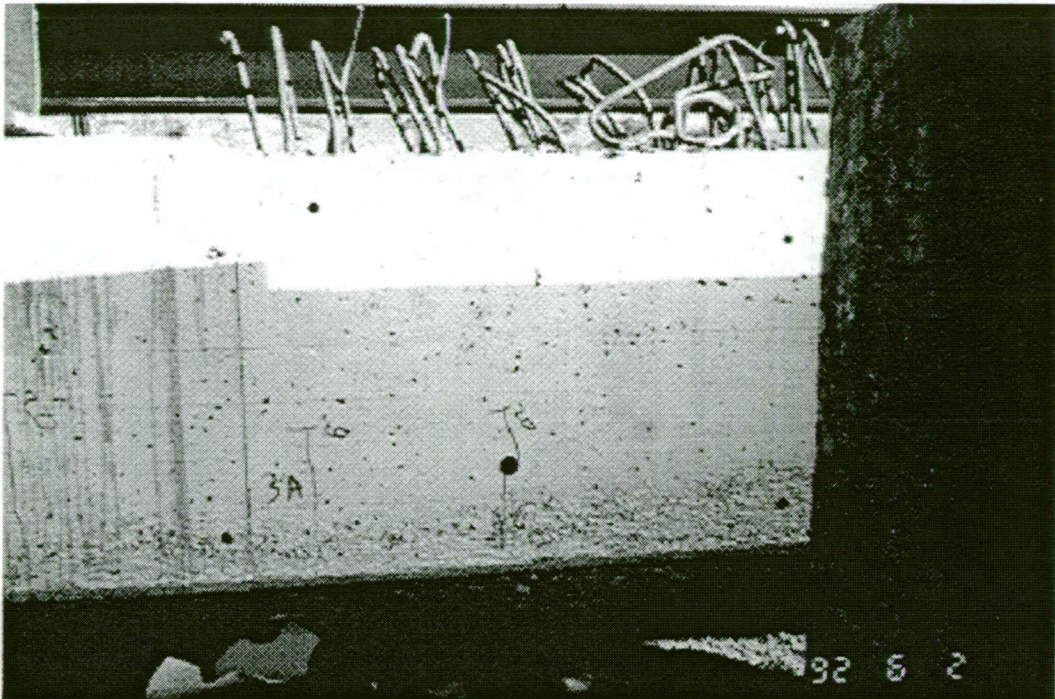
Flexural Beam Crack Patterns
